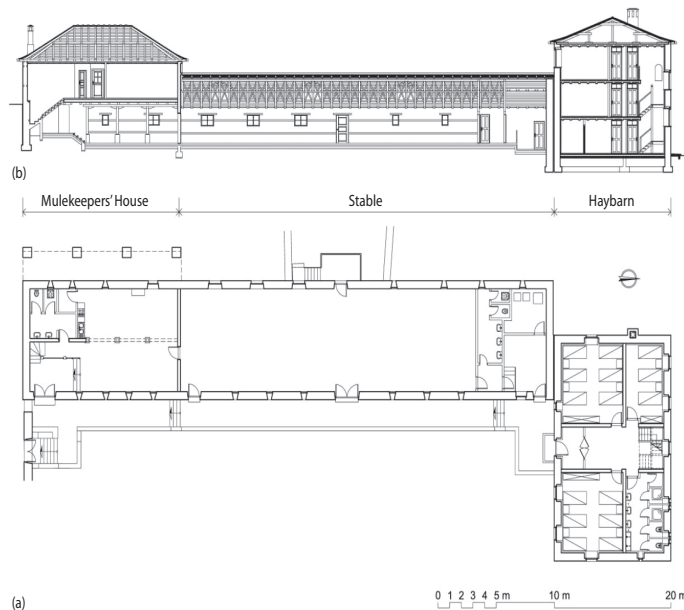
The Haybarn Complex (after the restoration): (a) ground floor plan, (b) cross-section [11]
